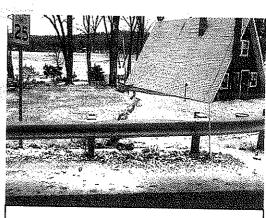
A Small ditch below Locks Pond Road storm drain. (DCR/DWSP)
